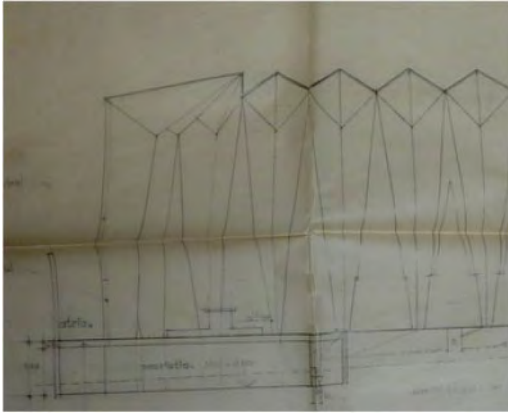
Longitudinal section of the chancel formed by six elements arranged radially with the roof above the hall, making it possible to install a skylight (Alberto González Pozo Archive in A. A. M.).
